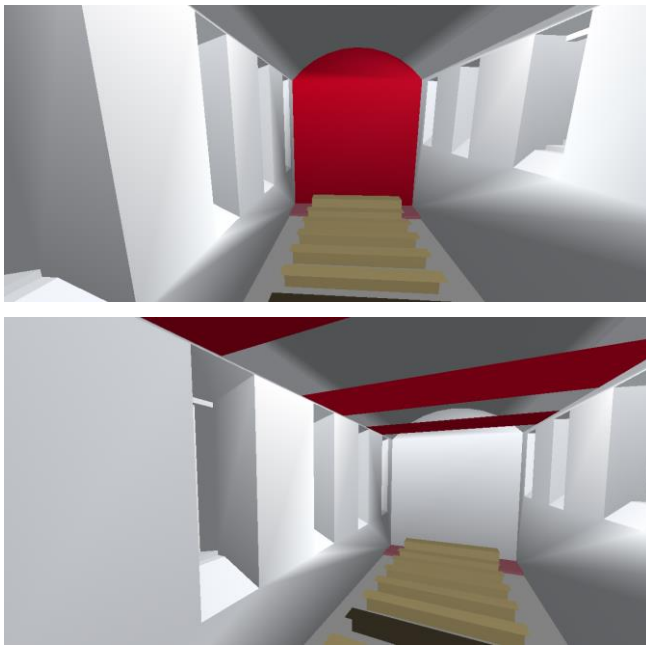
Panels on the wall behind teacher and under ceiling in the room T5.
